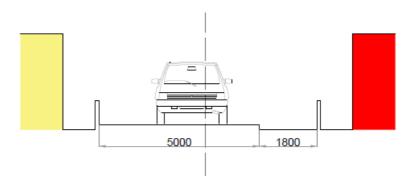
Proposed cross-section of 1.8m footpath length (RoW – 6.8M)
